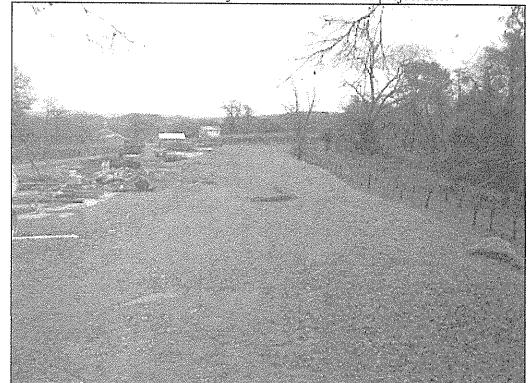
View to the east of the project site. Riparian corridor of Burton Creek.
